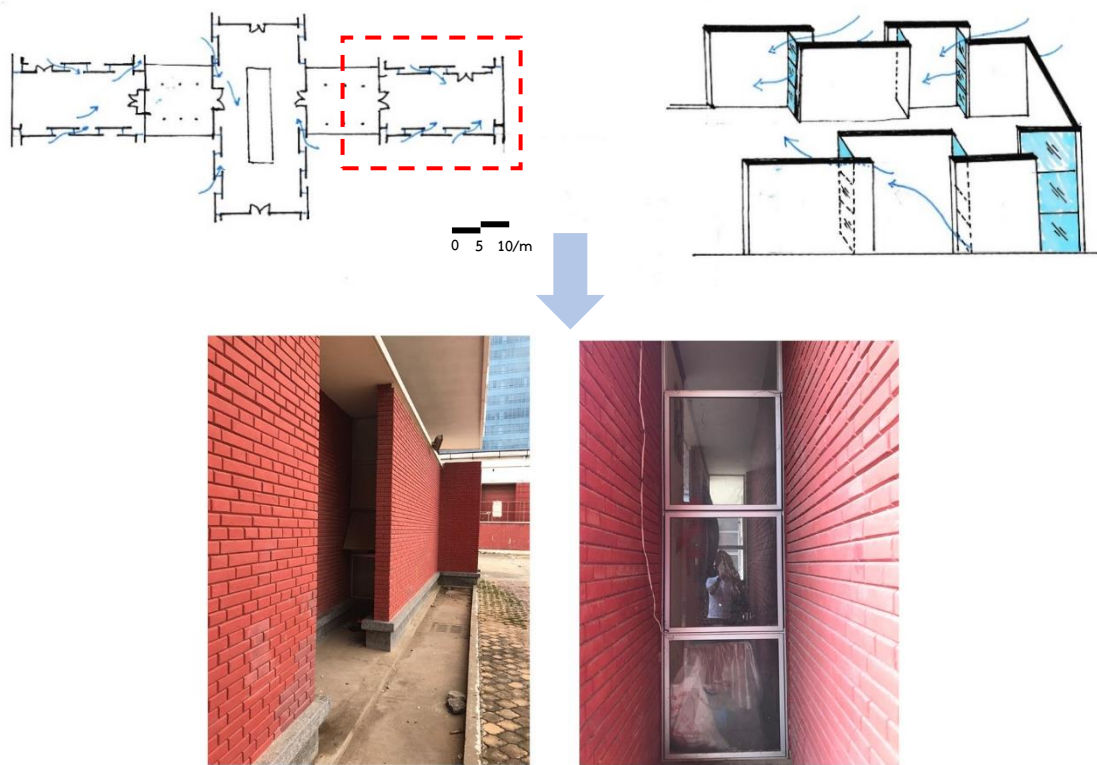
57 Diagram drawing analysis and photos displaying the wing walls and deep eaves structure, which offer shade from direct sunlight and allow ventilation in the building
